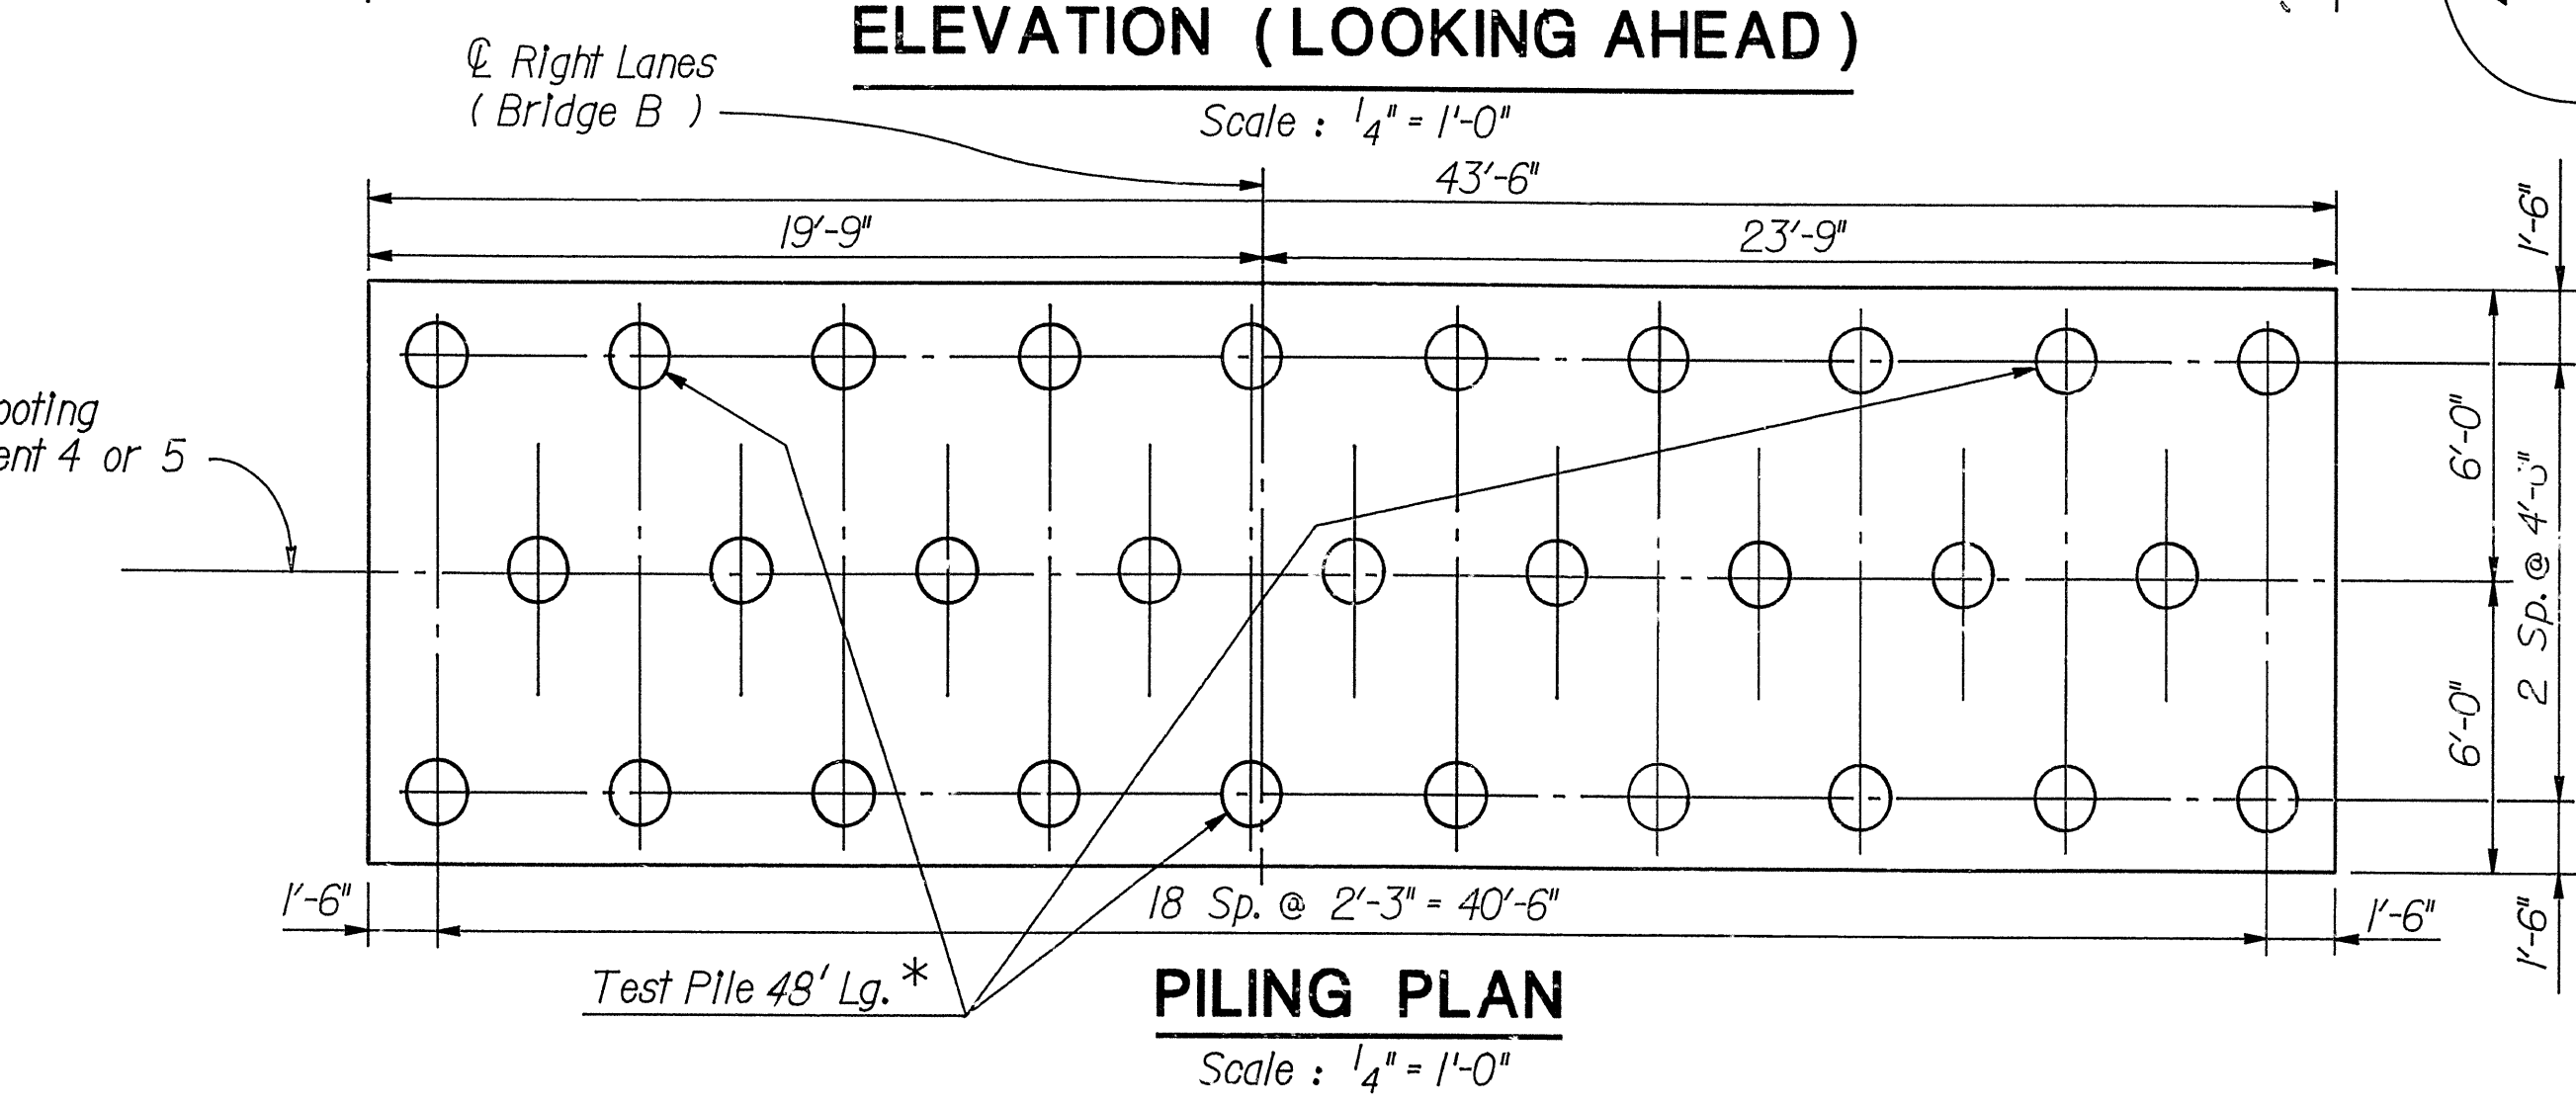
DETAILS OF INTERMEDIATE BENTS 4 & 5 BRIDGE B
